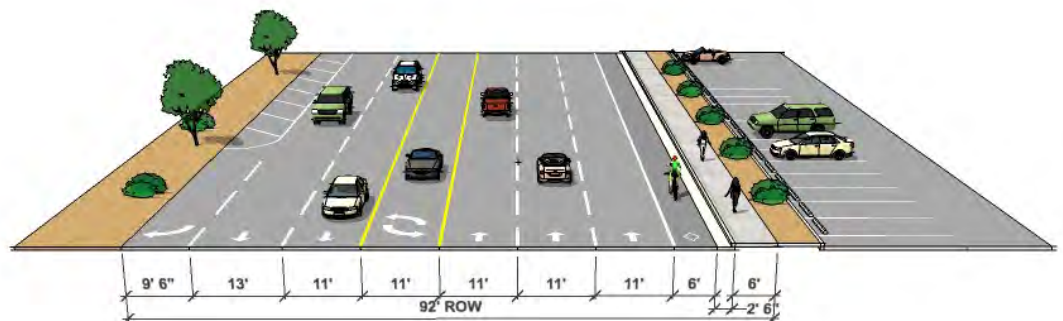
cc: Eubank Boulevard's 2009 Cross Section just North of Southern Avenue
